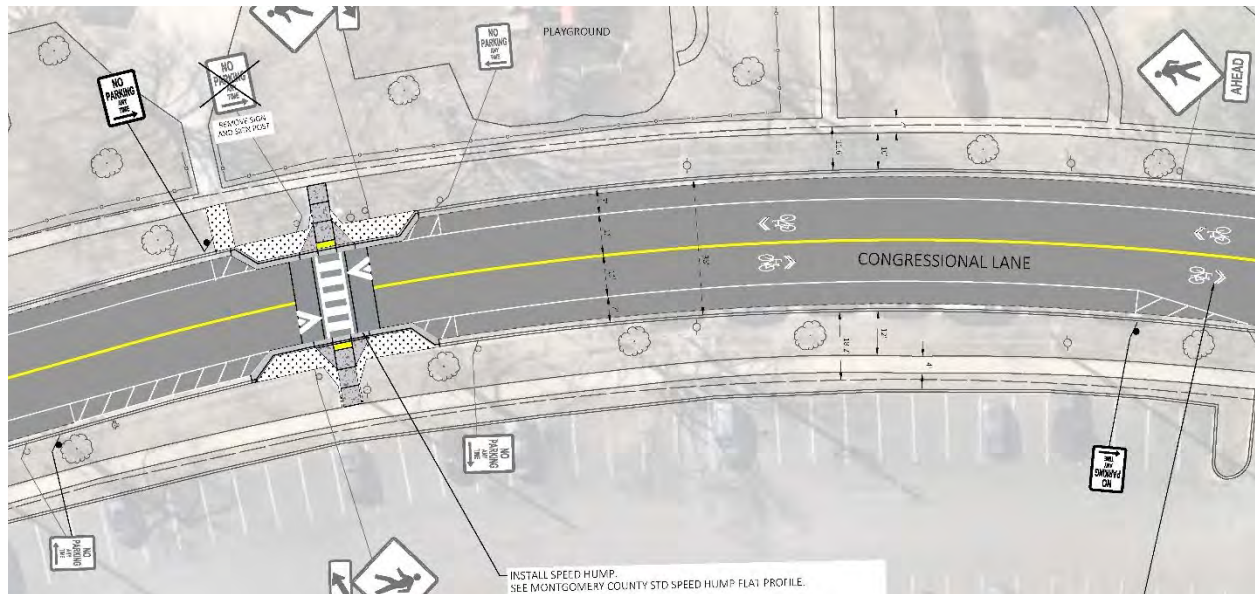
Raised crosswalk and replaced curb ramps at the Montrose Park midblock crossing (Concept 2, sheet 2).
